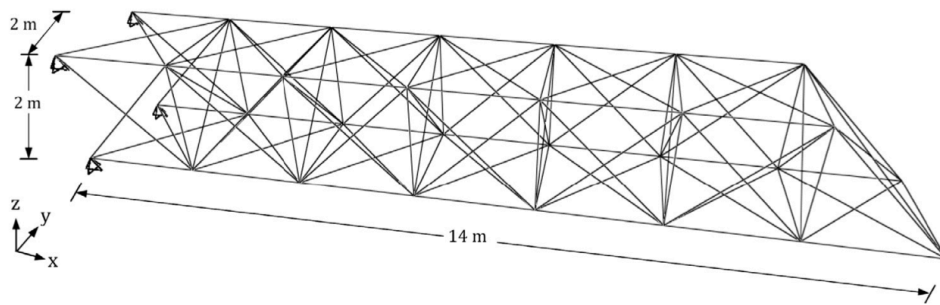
117-Bar Cantilever Truss (Azad 2017)
